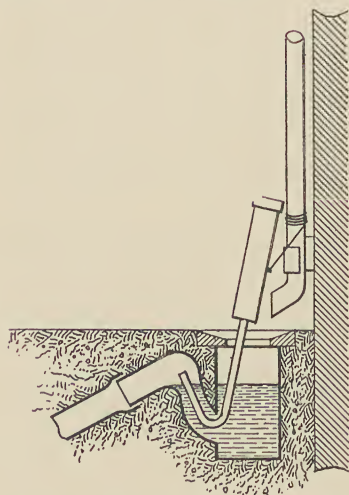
Sheath with Bent Brass Tube for Smoke-rocket.
